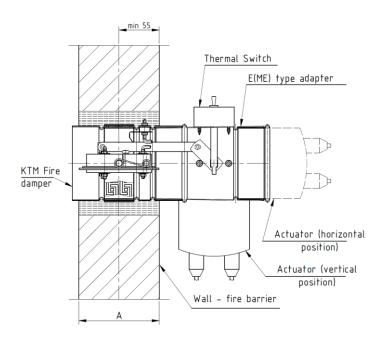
Installation of KTM-E(ME) fire dampers in fire barriers.
